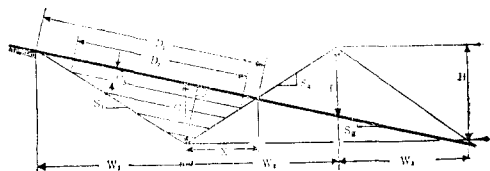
Location and dimensions of scraper cuts on a broad-base terrace.
